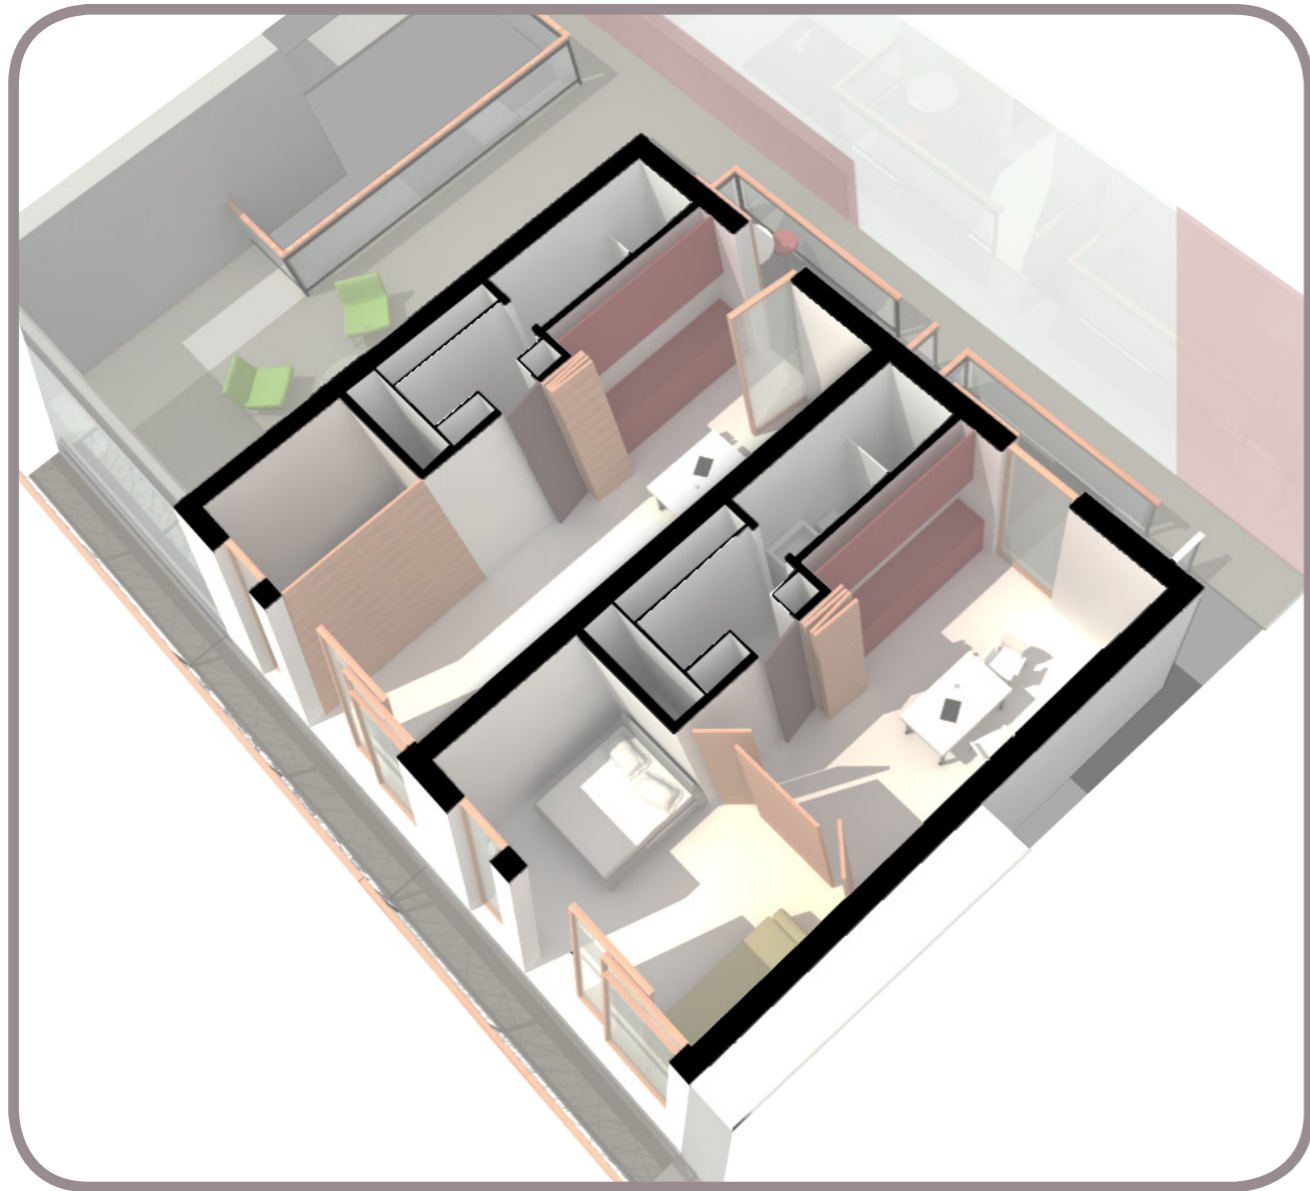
Illustrated internal view - 1 bedroom apartment
